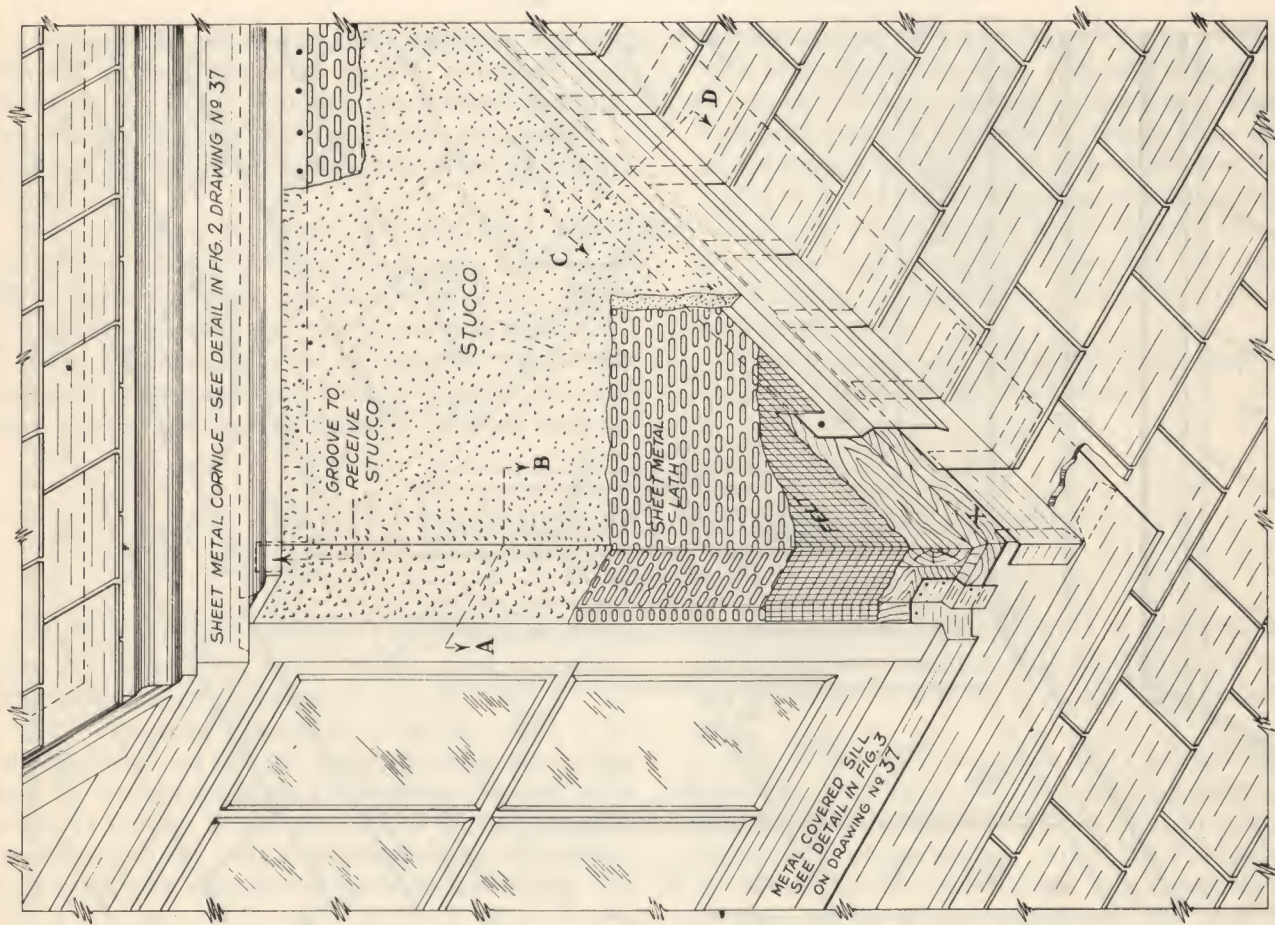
FLASHING DORMER WINDOW WHEN CHEEKS ARE COVERED WITH STUCCO
